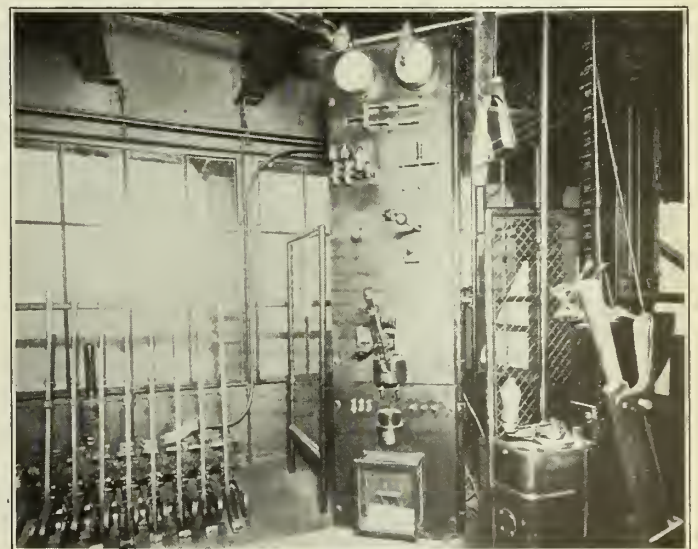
Bridge No. 17—View Inside of Operator's House.
